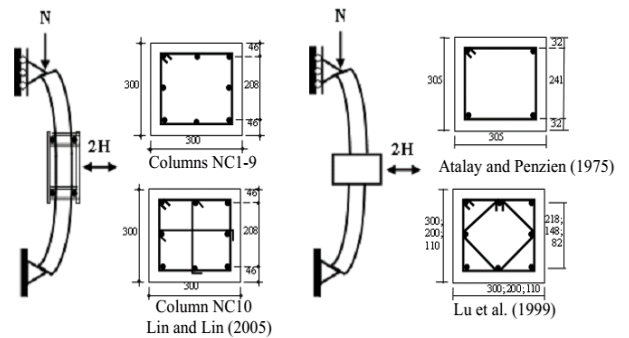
Test setups (double ended) and details of columns (unit: mm)
